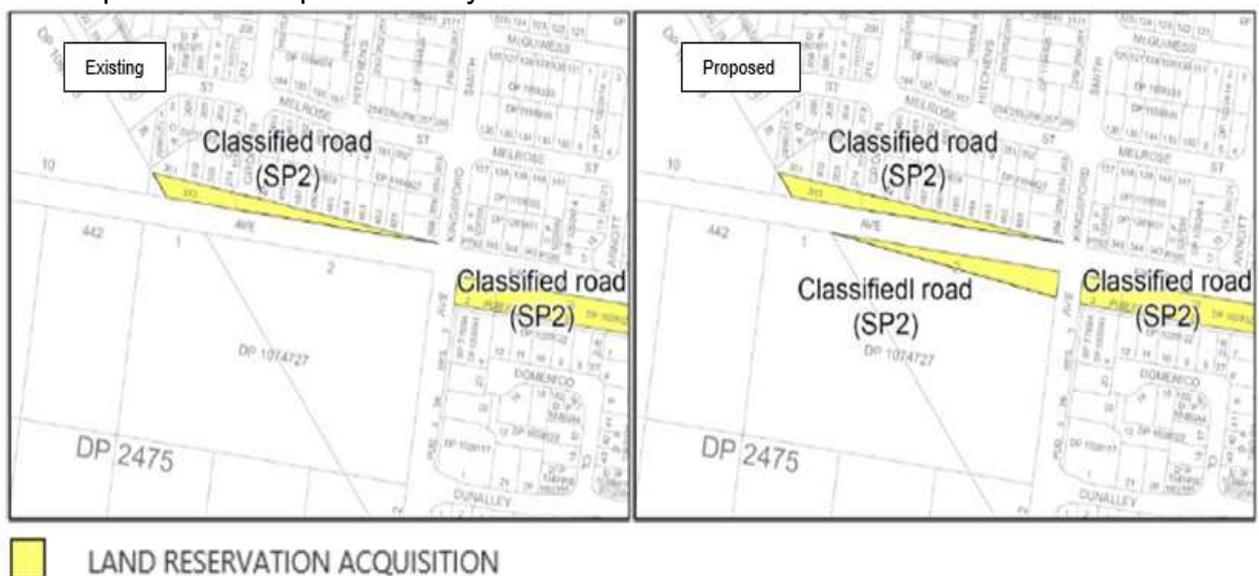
Existing and Proposed Fifteenth Avenue reservation
